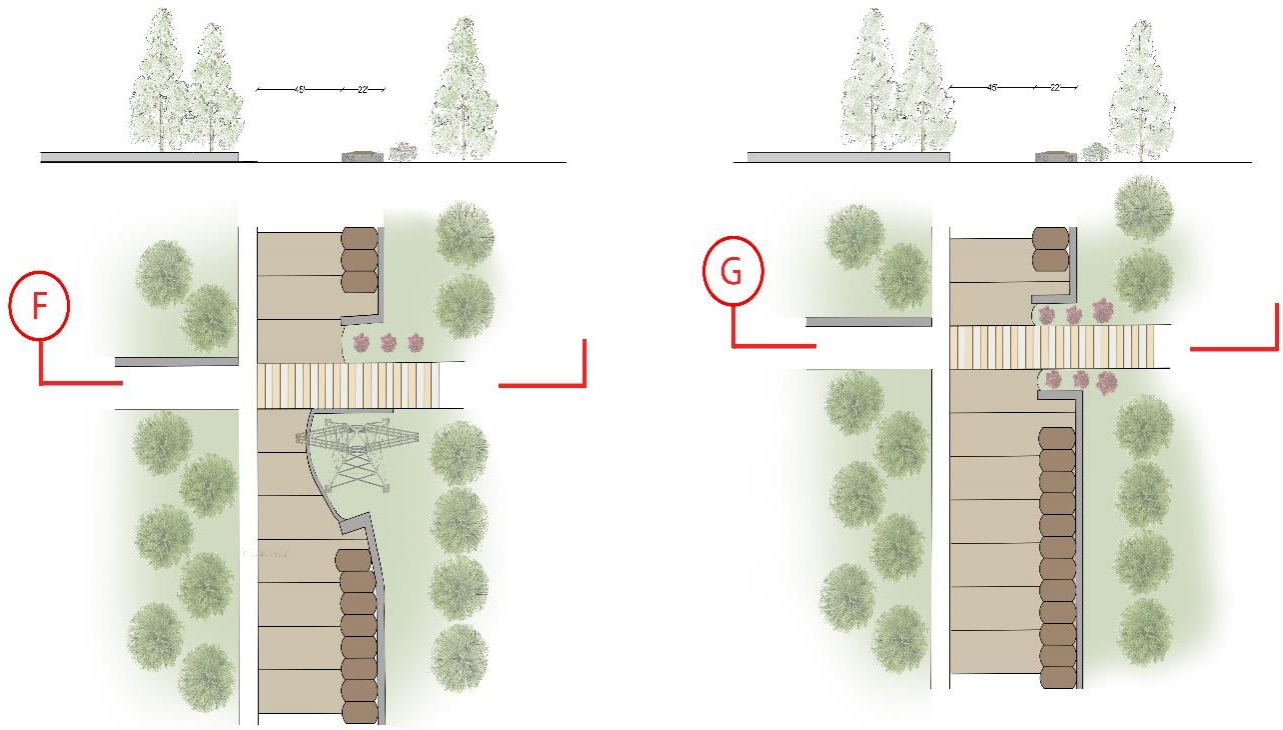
Sections F and G. Entrances to the site connecting townhouse neighborhood with site.
